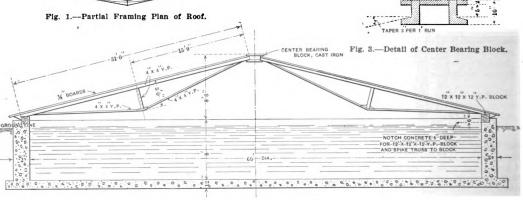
Sectional Elevation of Reservoir and Roof, Showing Truss Arrangement,
